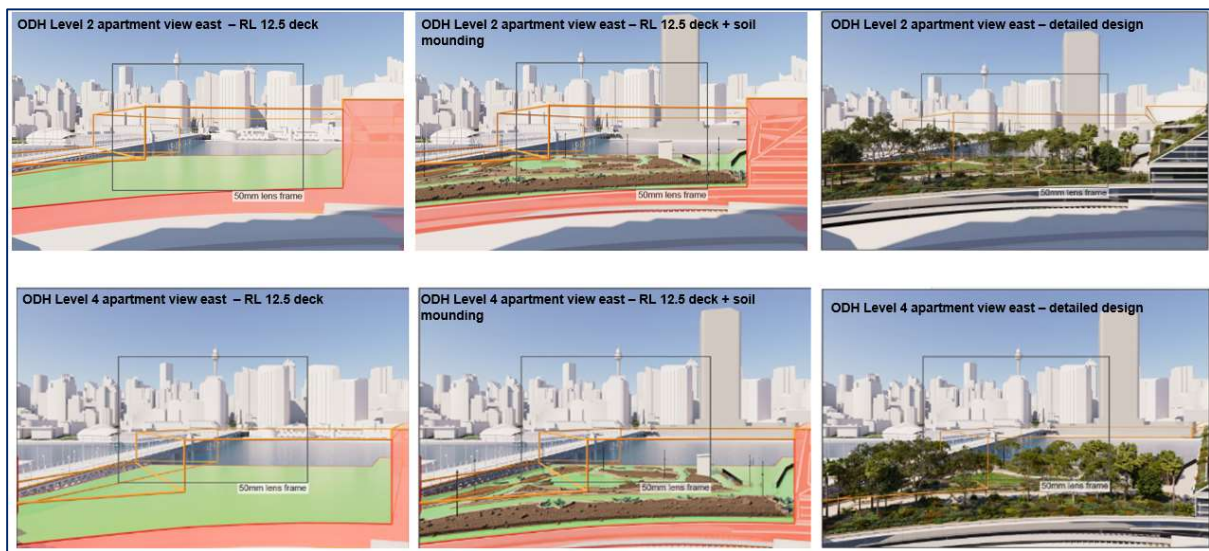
| Sample of proposed views showing the approved RL12.5 podium (left) proposed soil mounding in isolation (middle) and proposed landscape planting (right) from lower-level apartments within ODH facing east (Base source: Applicant's VVIA)
